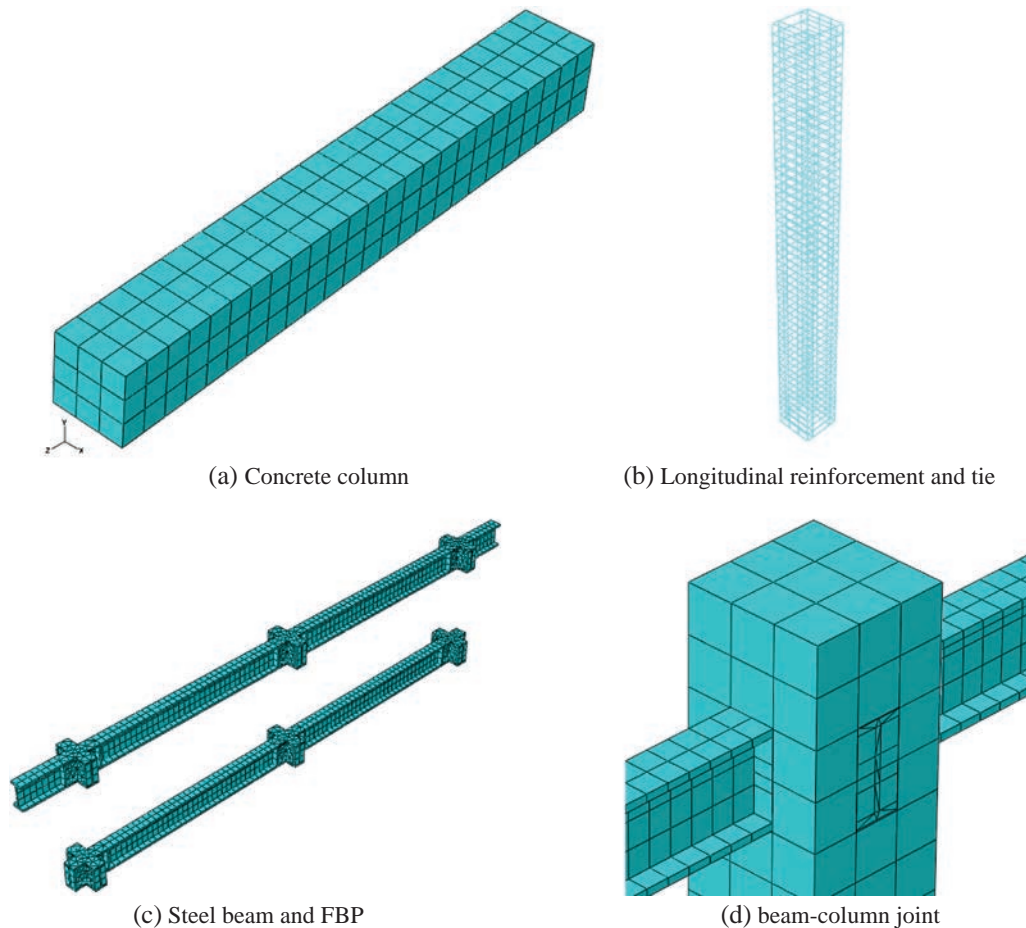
Meshing sketch of section. (a) Concrete column, (b) longitudinal reinforcement and tie, (c) steel beam and face bearing plate and (d) beam–column joint.
